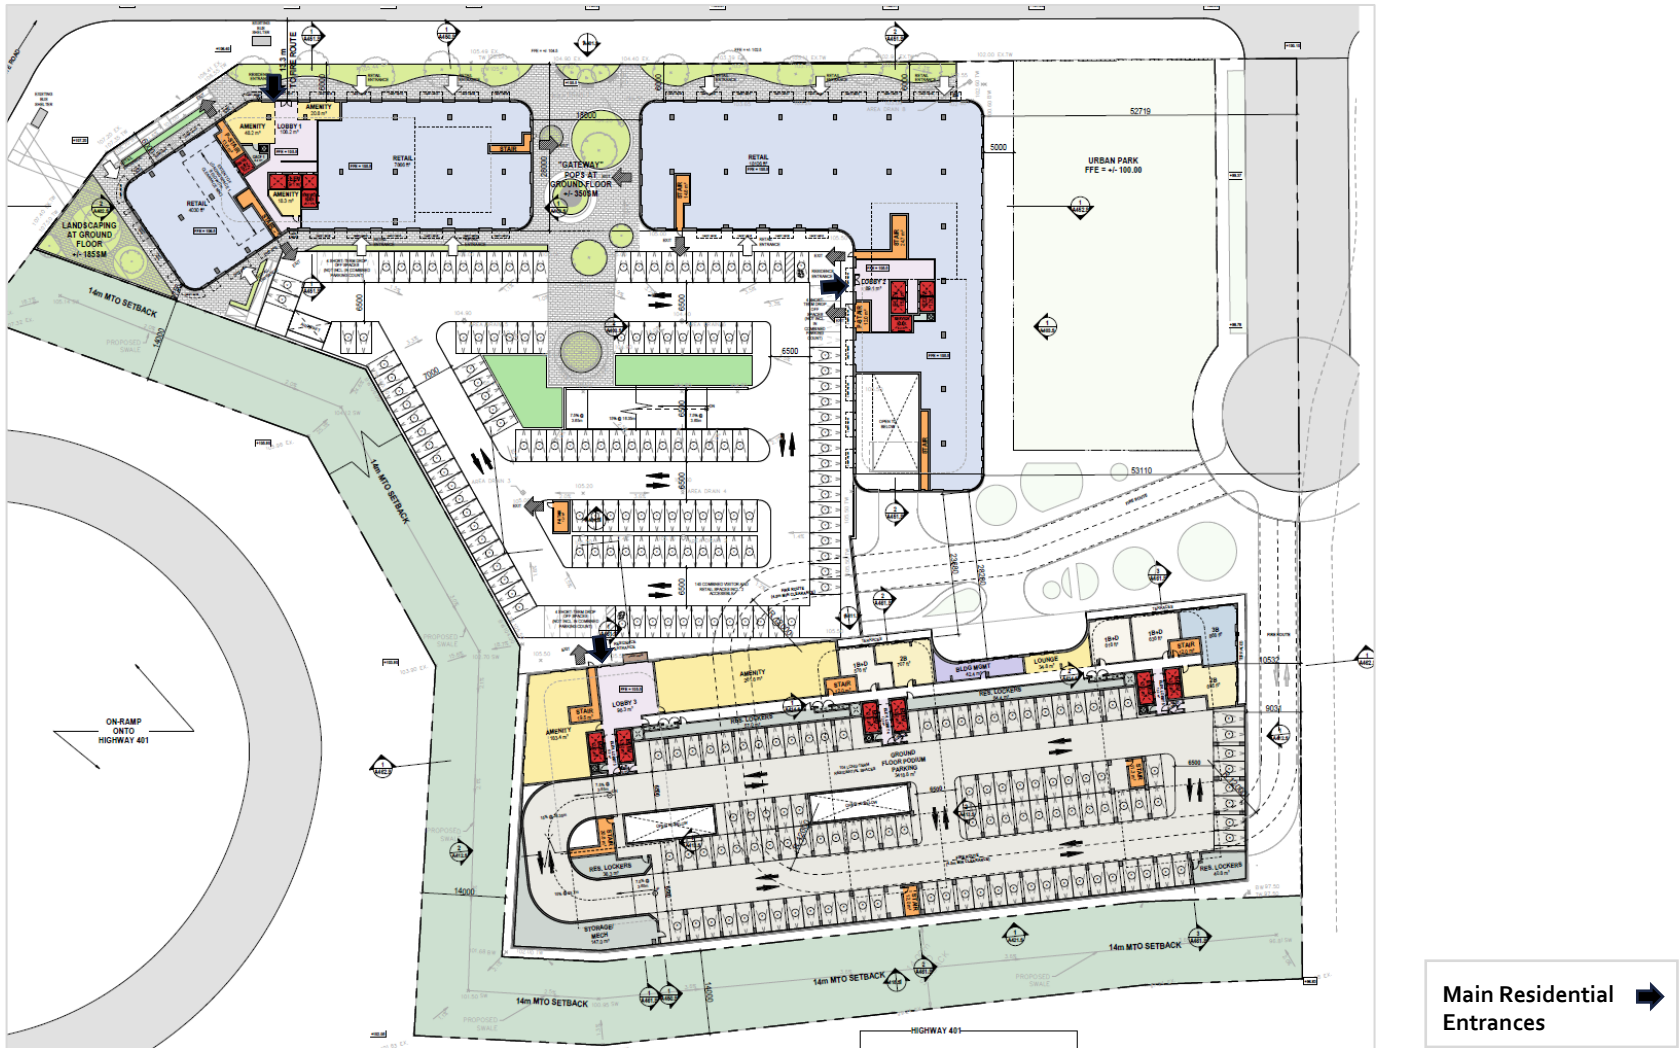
Proposed Ground Floor Plan, Courtesy: BDP Quadrangle Inc.
